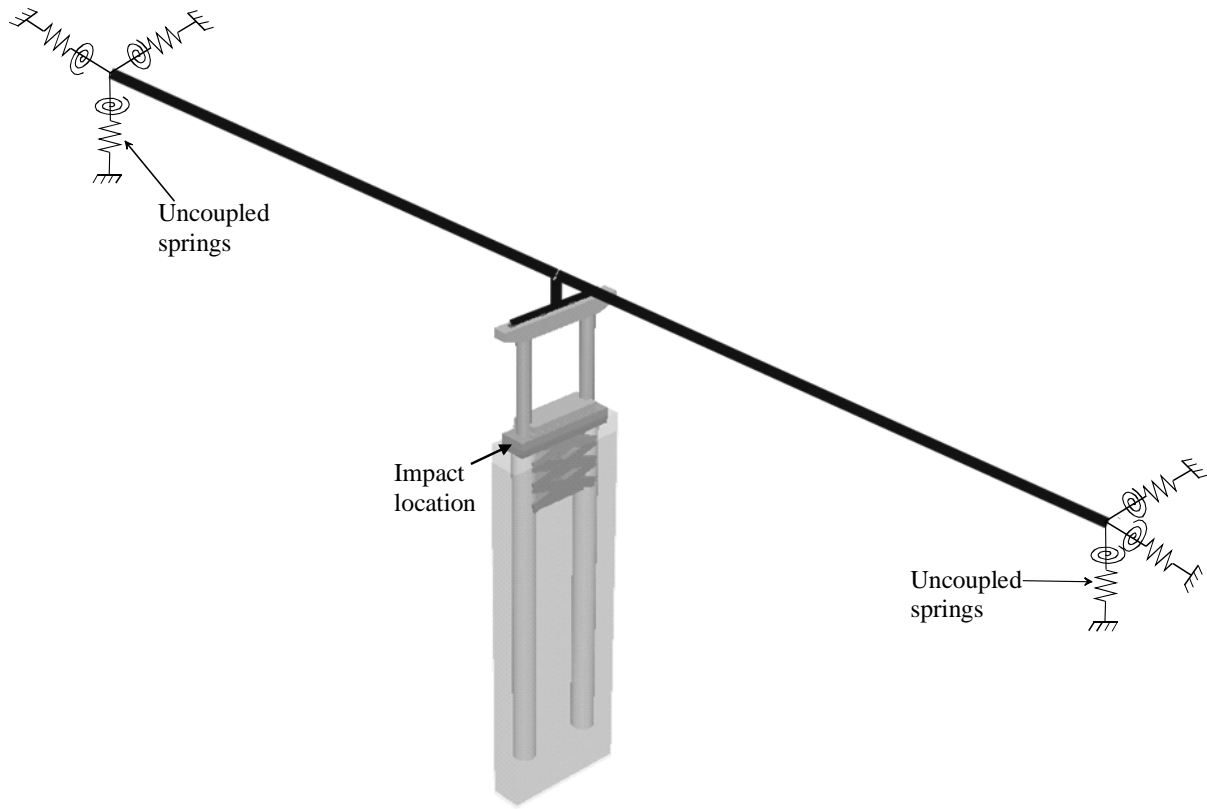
Structural configuration for Blountstown Bridge channel pier (BLT-CHA)
